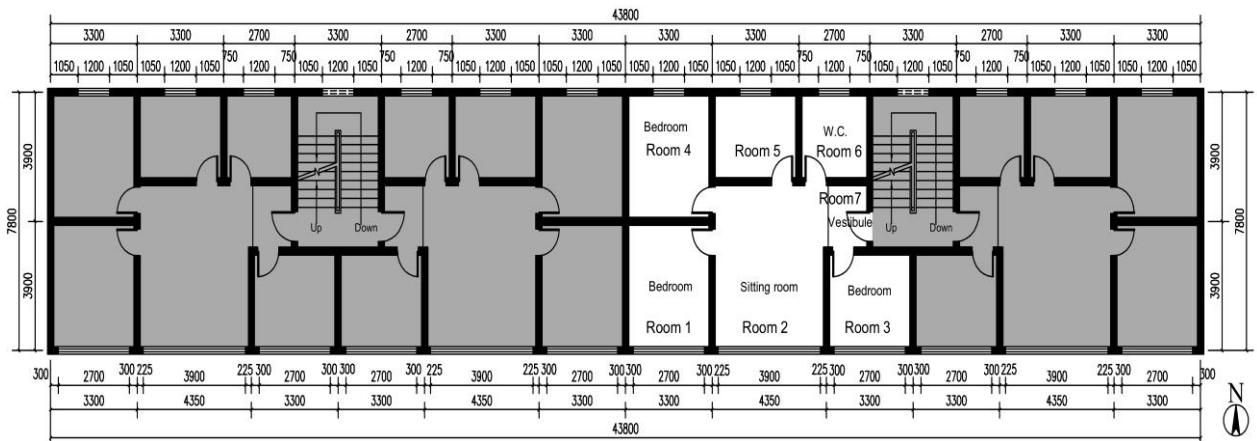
Standard floor plan of the direct solar gain design model (Unit: mm)
